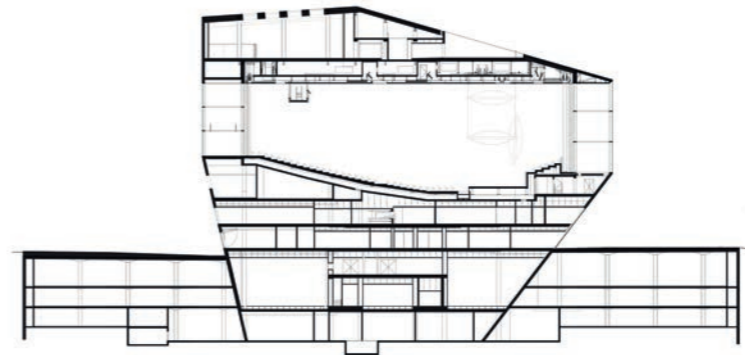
Casa da Musica longitudinal building section. Drawing from OMA
